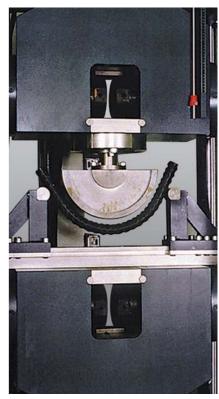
Flexure test kit for steel rebar installed in specimen grips for tensile tests
